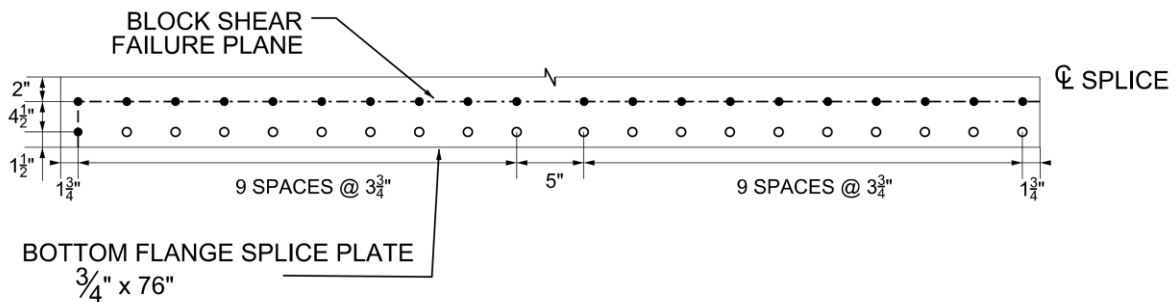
Assumed Block Shear Failure Planes for Bottom Flange Splice Plates
